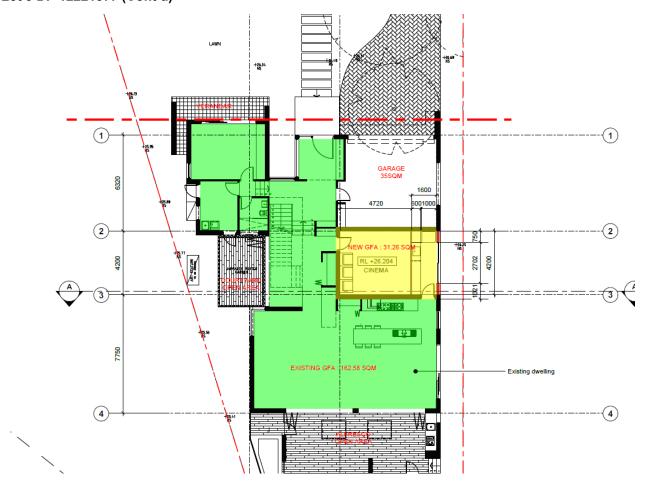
A site plan of the subject dwelling, where the added cinema and internal storage area is highlighted in yellow.
